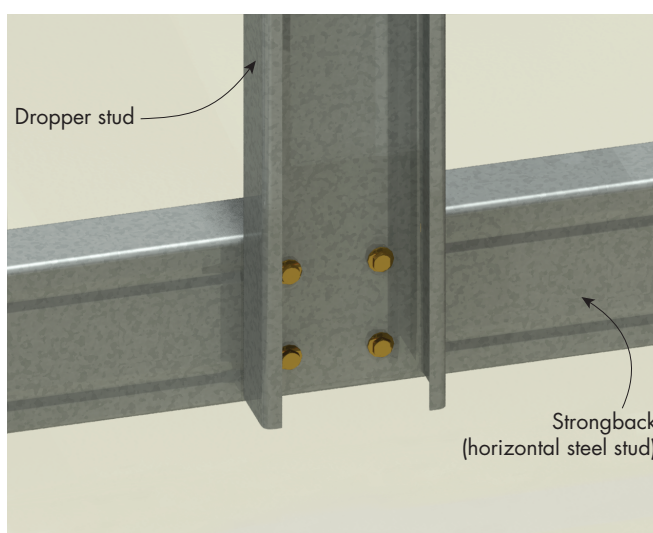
Seismic Stud Ceiling Type A3 - Fixed / Sliding
